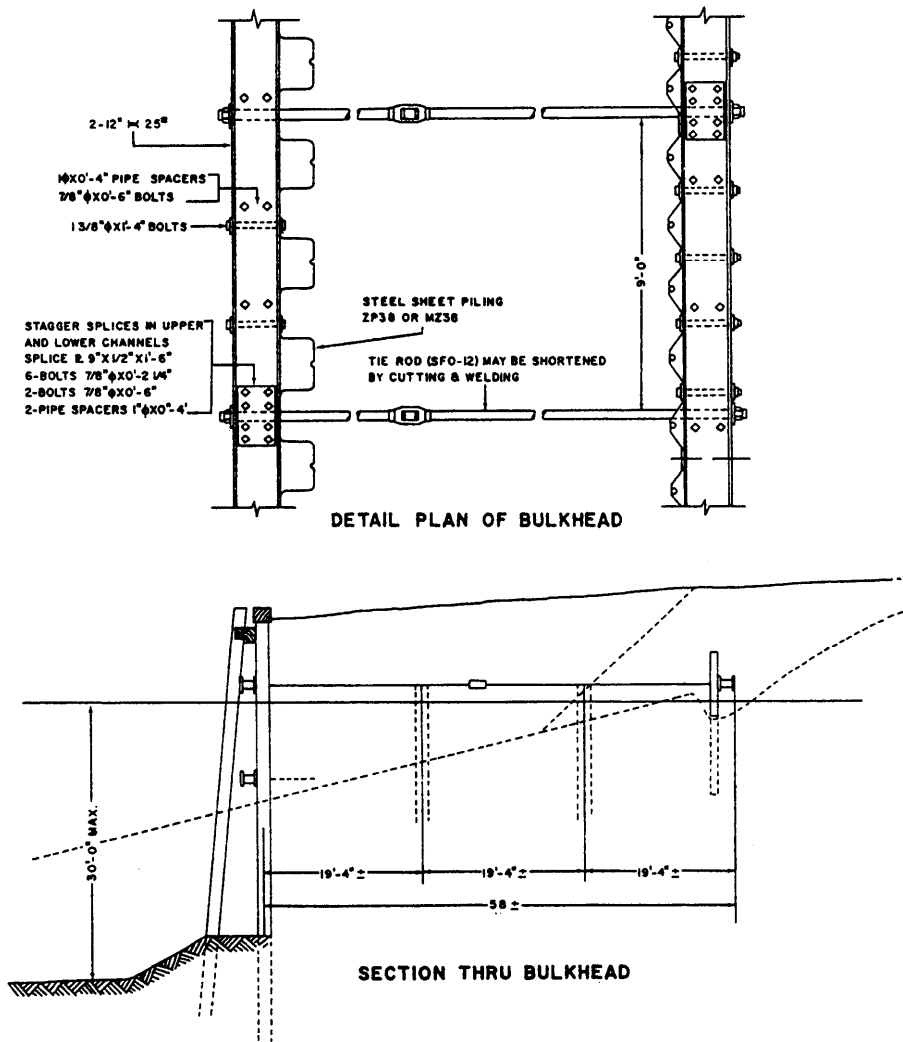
Working drawings for steel sheet-pile bulkhead.
